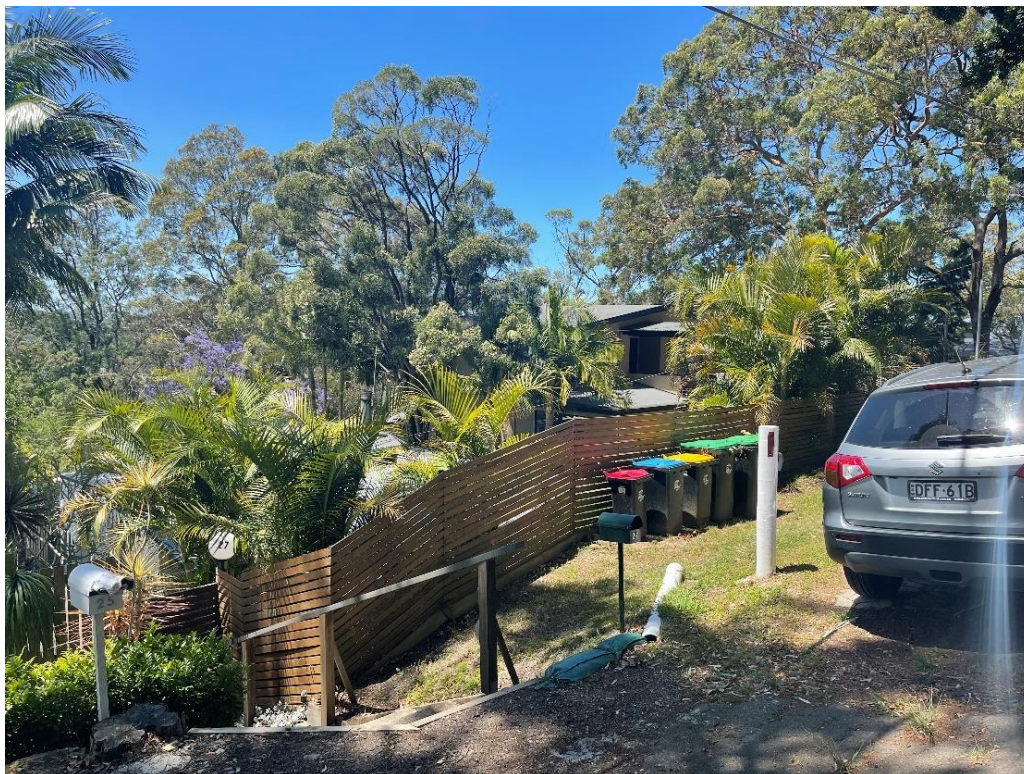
View of subject site and existing gravel parking area forward of the dwelling, with pedestrian entry to the neighbouring dwelling at No 27 Alleyne Avenue
